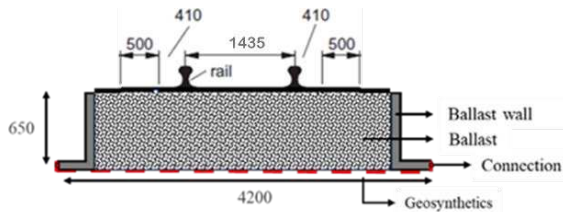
Illustration of an assumed field Ballast wall arrangement (dimensions in mm)
